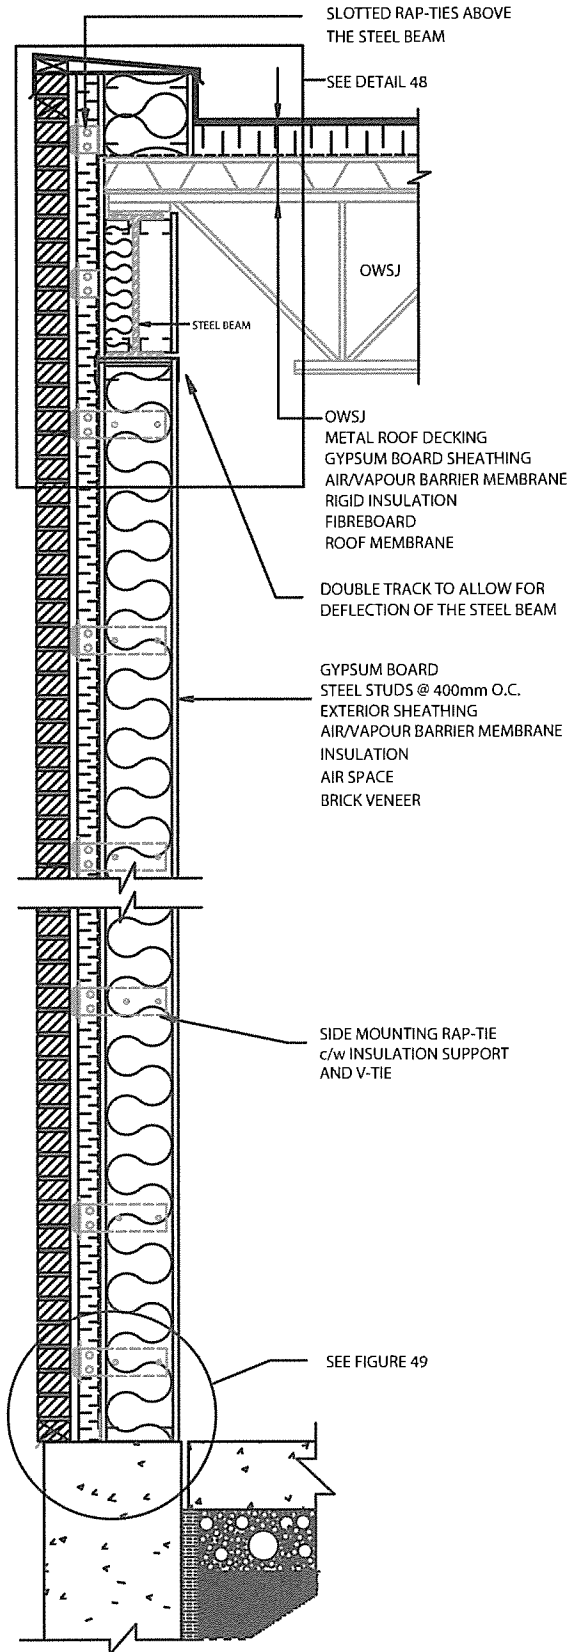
BRICK VENEER / STEEL STUD - O.W.S.J.
